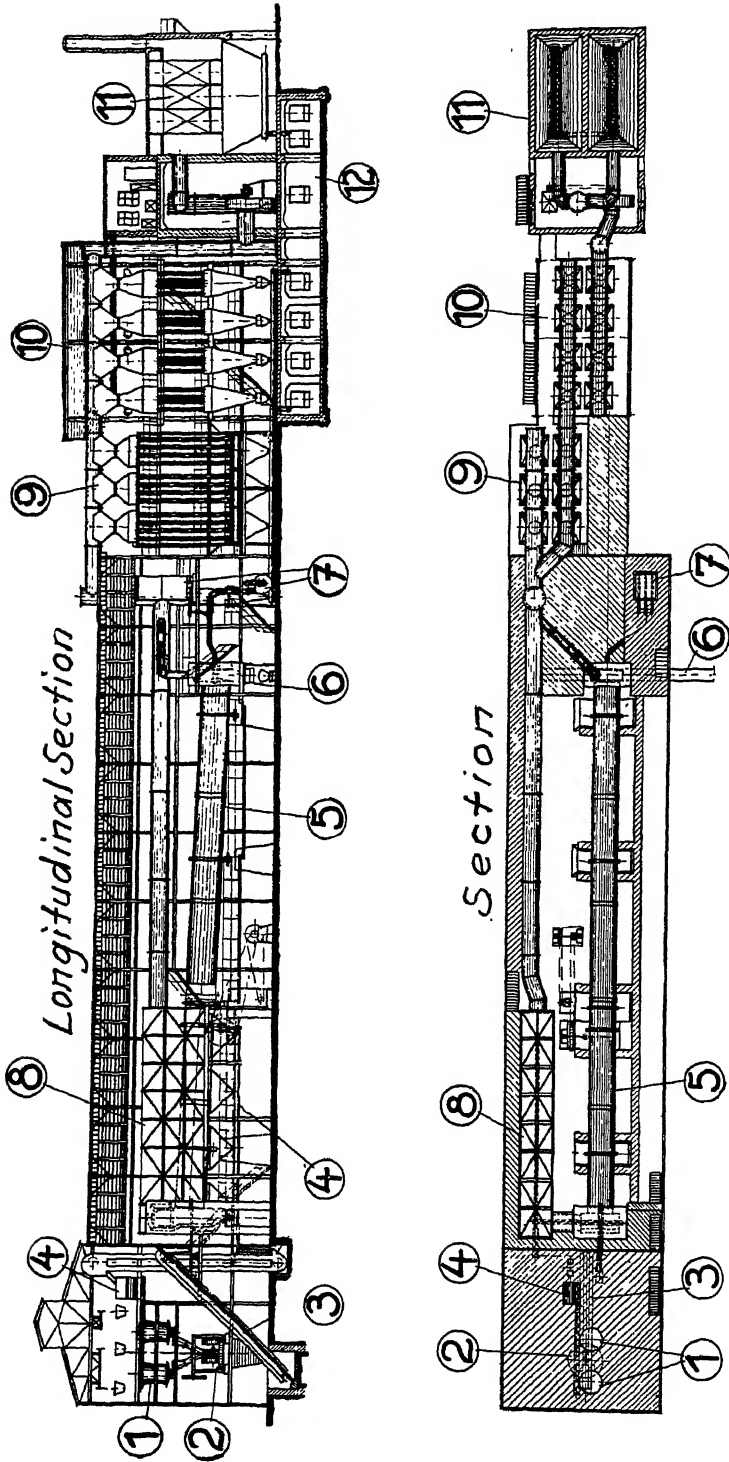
LONGITUDINAL SECTION AND CROSS-SECTION OF A WAELEZ PLANT.
